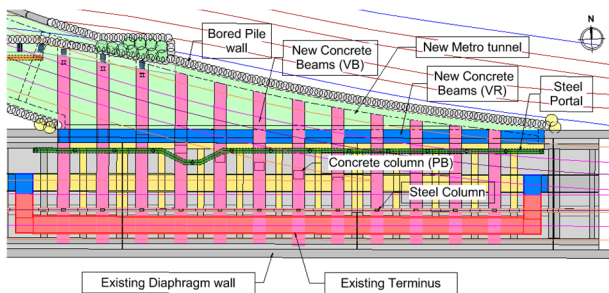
Plan: Demolitions and new structures to be built and preserved.
